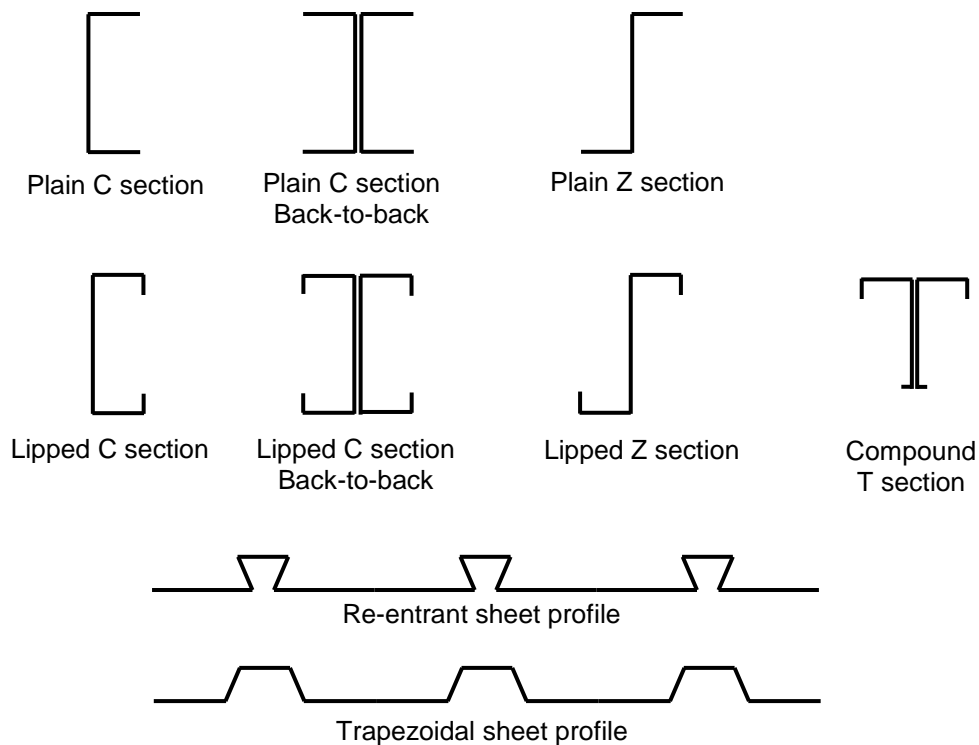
Typical cold-formed steel open sections and sheet profiles
